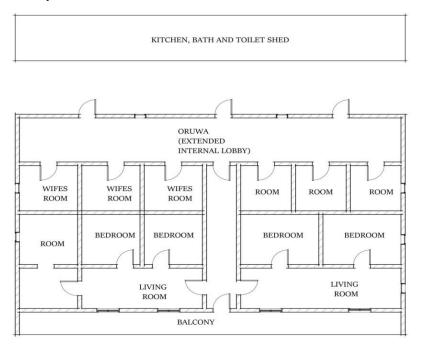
Plan of Fagbamiye House Ile-Oluji.
